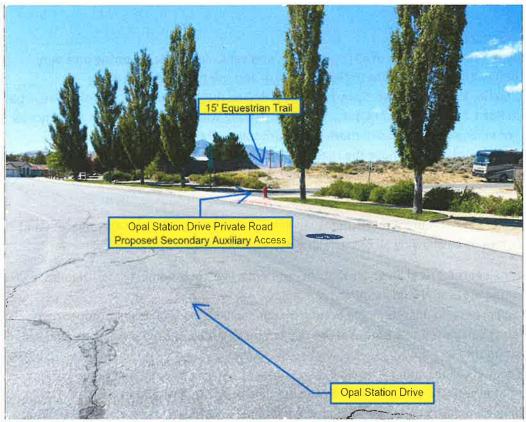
Proposed Secondary Auxiliary Access via Opal Station Drive Private Road
